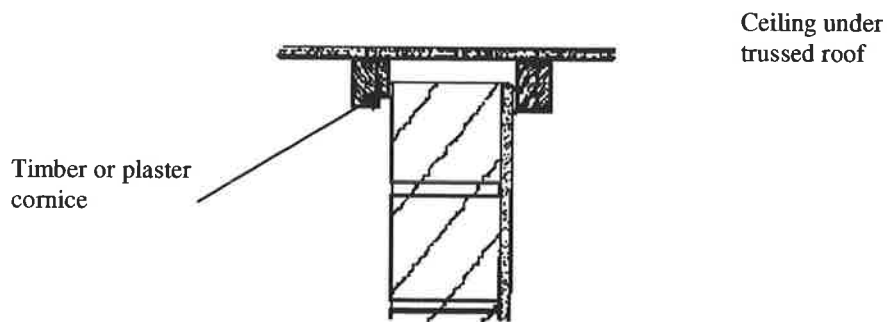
Internal Partition Wall 'Cornice' Connection Detail
